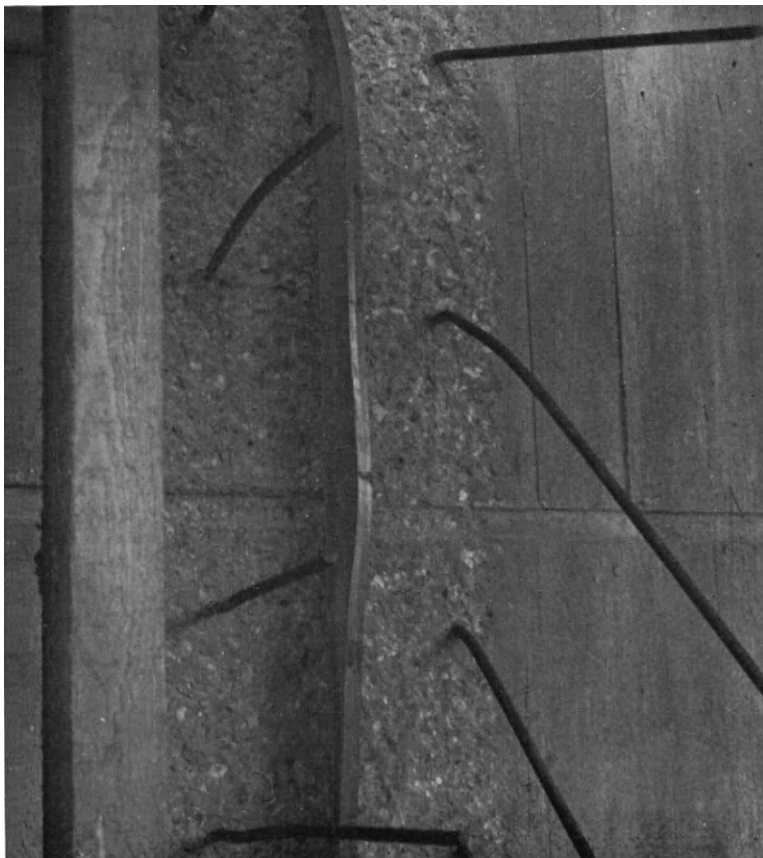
Surface bush hammered around starter bars and P.V.C. water bar to ensure first-class construction joint.
